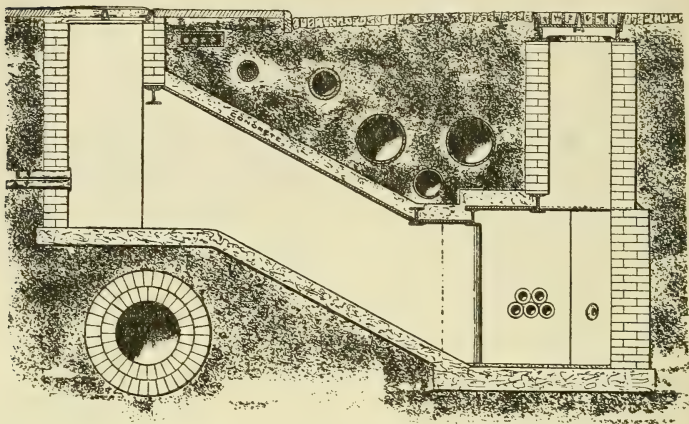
Section of Double Manhole (Scale $\frac{1}{4}$)
